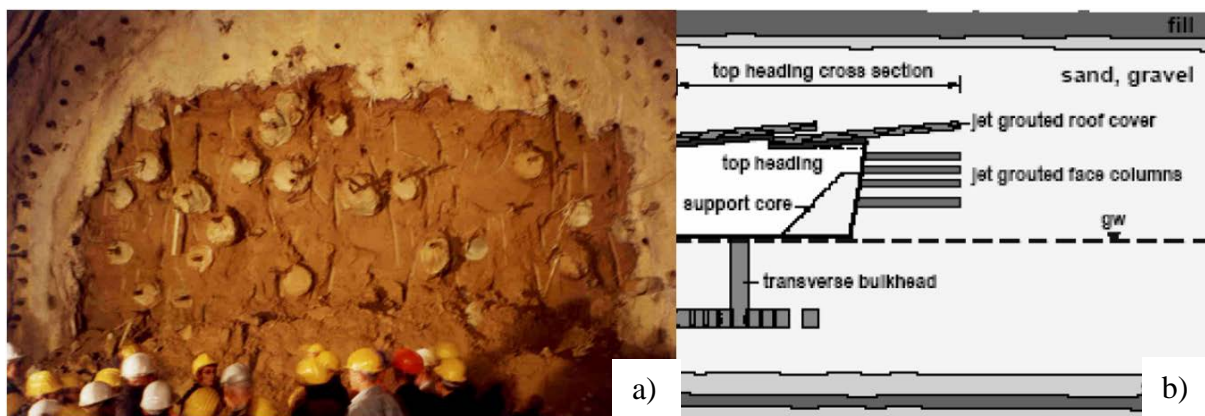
a) Example of jet grouted face columns; b) scheme of the construction details of the Frankfurter Kreuz tunnel(Almeida e Sousa, 2019; Quick et al., 2001).
